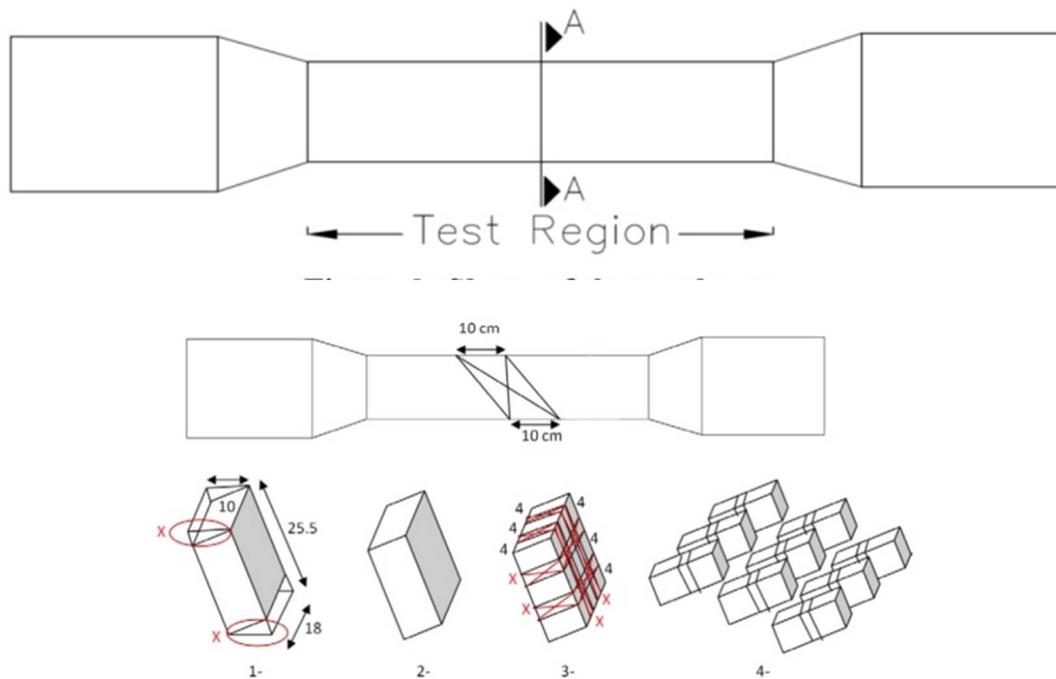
Tested beams by Mohammed I. and Ekkehard F., (2016).
